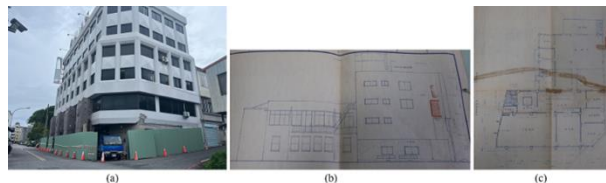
(a) street view, (b) elevation view, and (c) plan view of Building D10.
